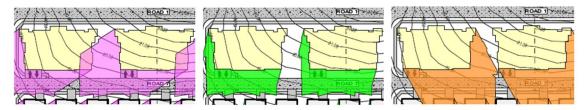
Partial extract showing 9am, 12 noon and 3pm shadow impacts to serviced housing dwellings
